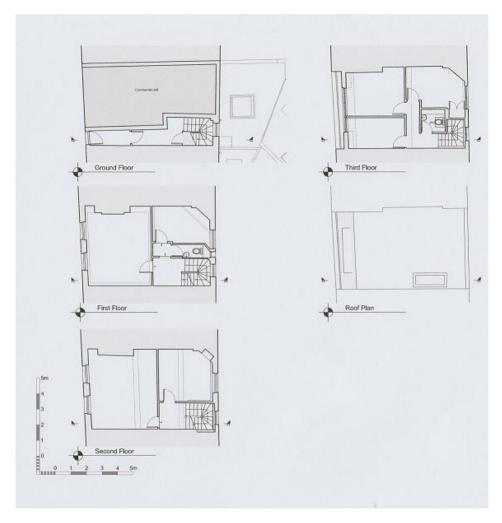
Plans of all floors as existing (Brooks Murray Architects)
